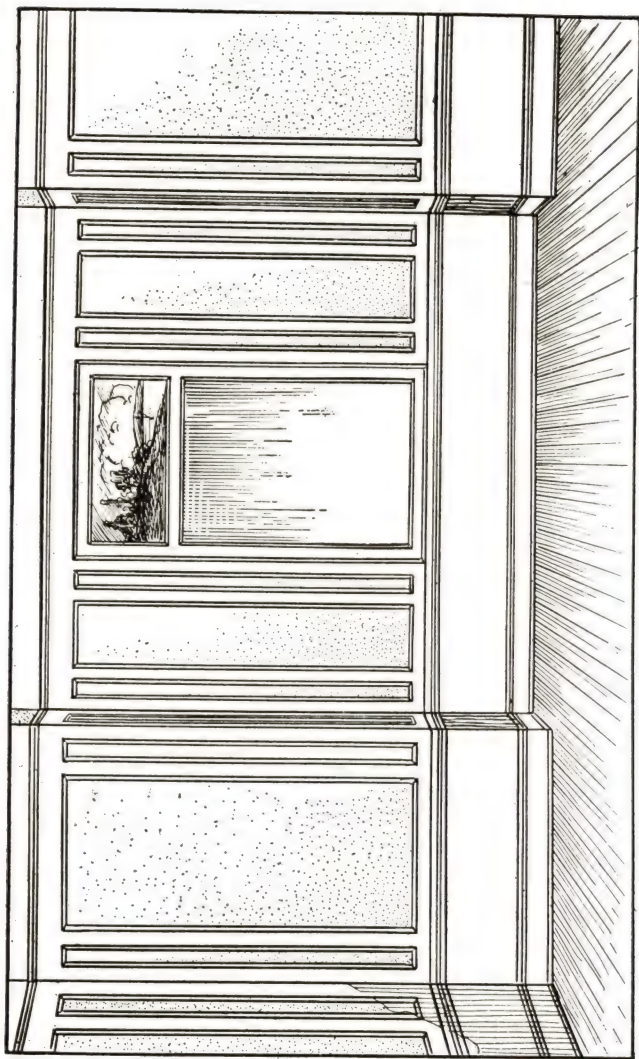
Another Arrangement of Panels on Living Room Walls.
